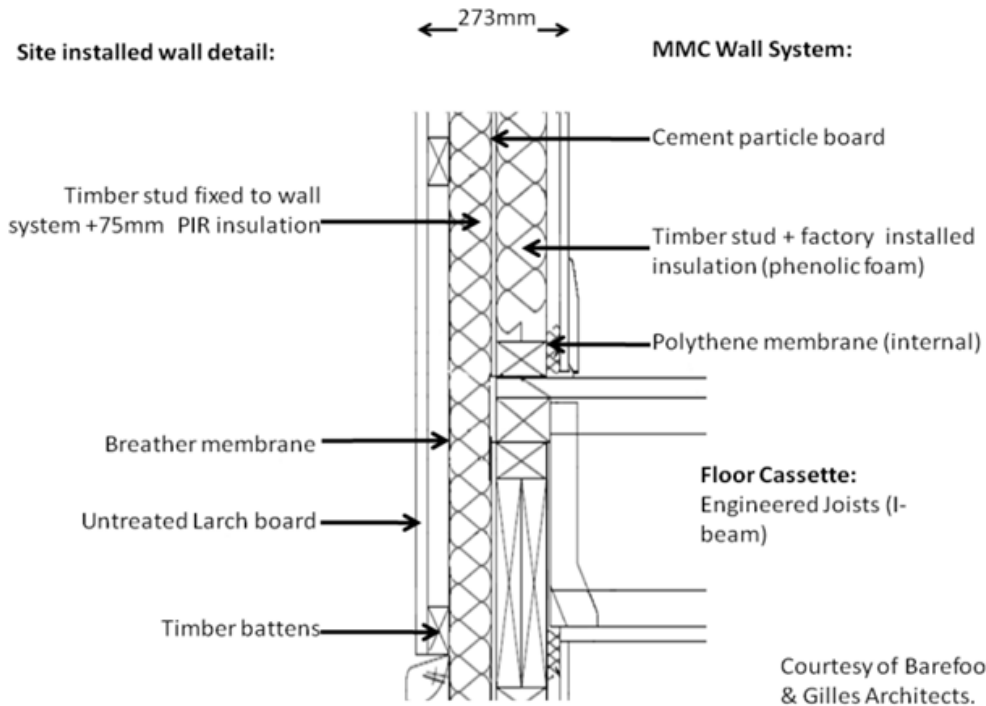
Sketch of MMC wall and floor components (source: Barefoot and Gilles Architects 2008)
